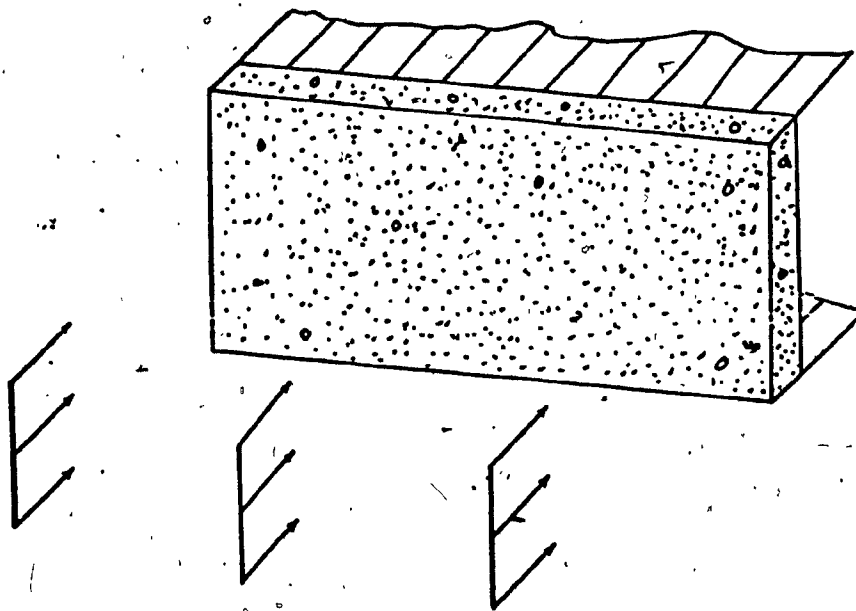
Horizontal Forces Perpendicular to the Plane of the Precast Concrete Wall Element
